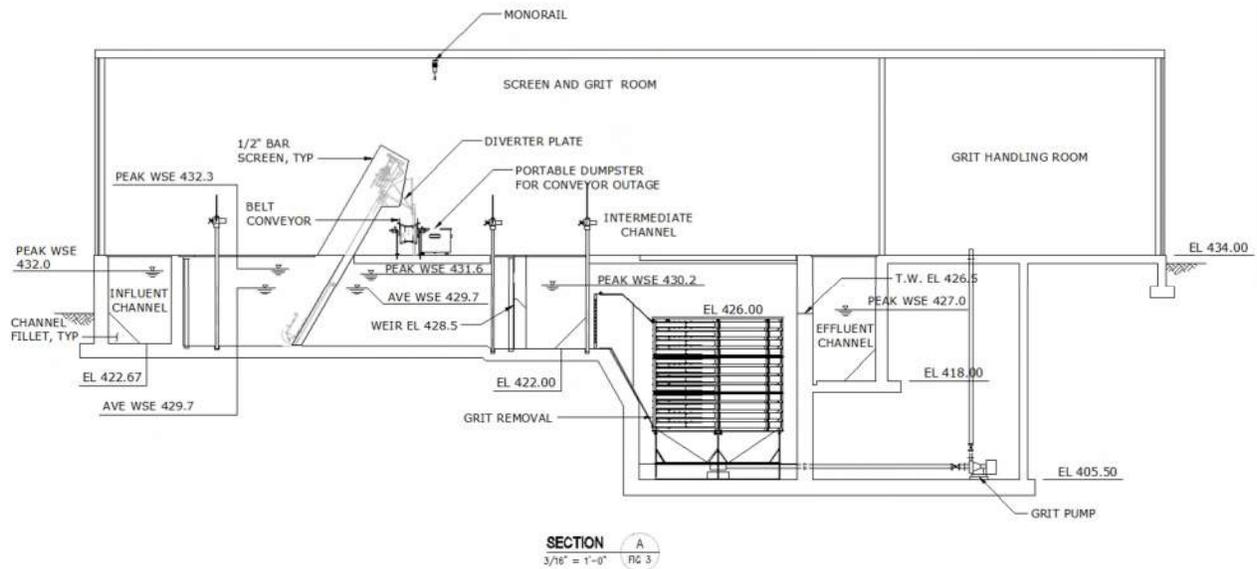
Alternative 3 Facility Section with Initial Hydraulic Elevations
